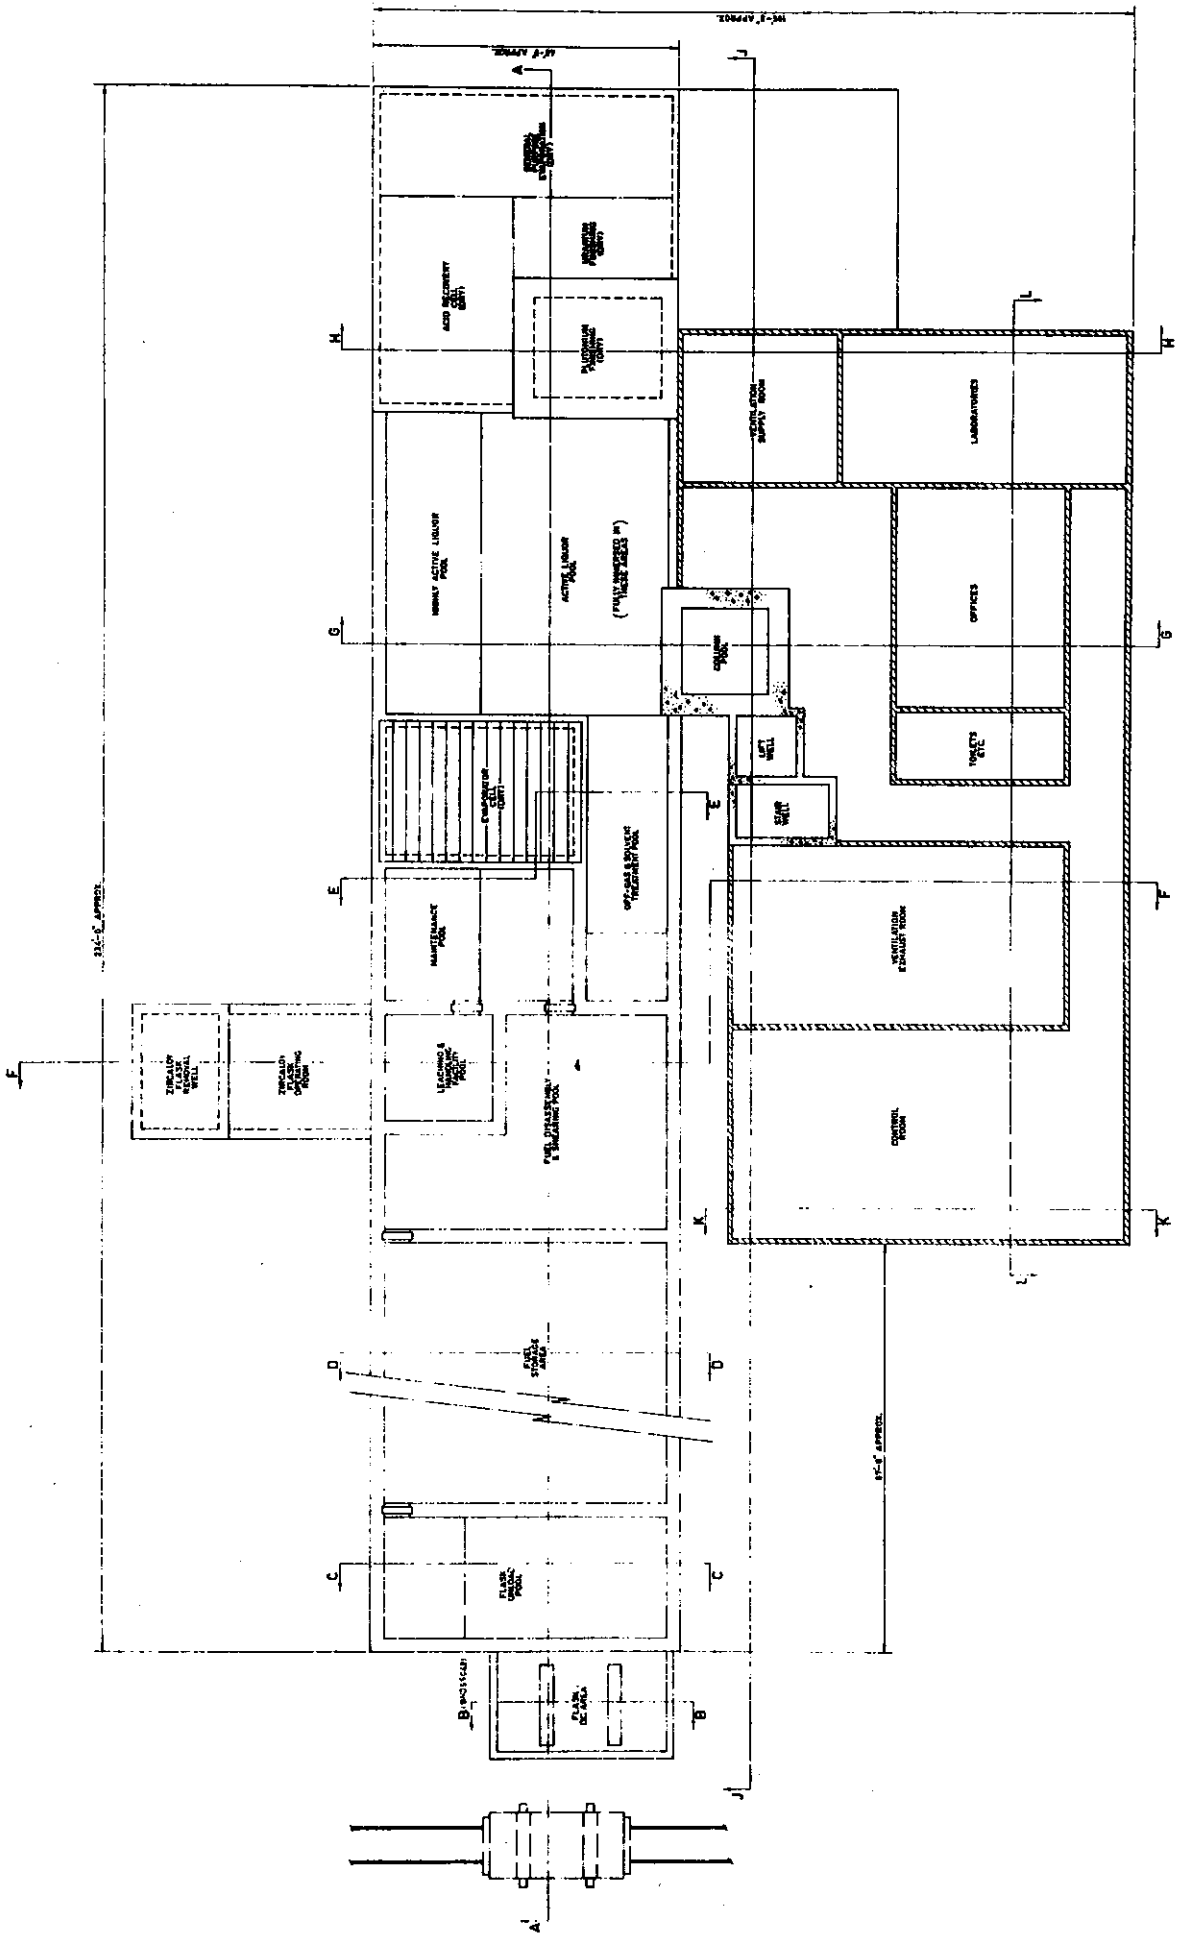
BUILDING LAYOUT - PLAN AT 16 ft
